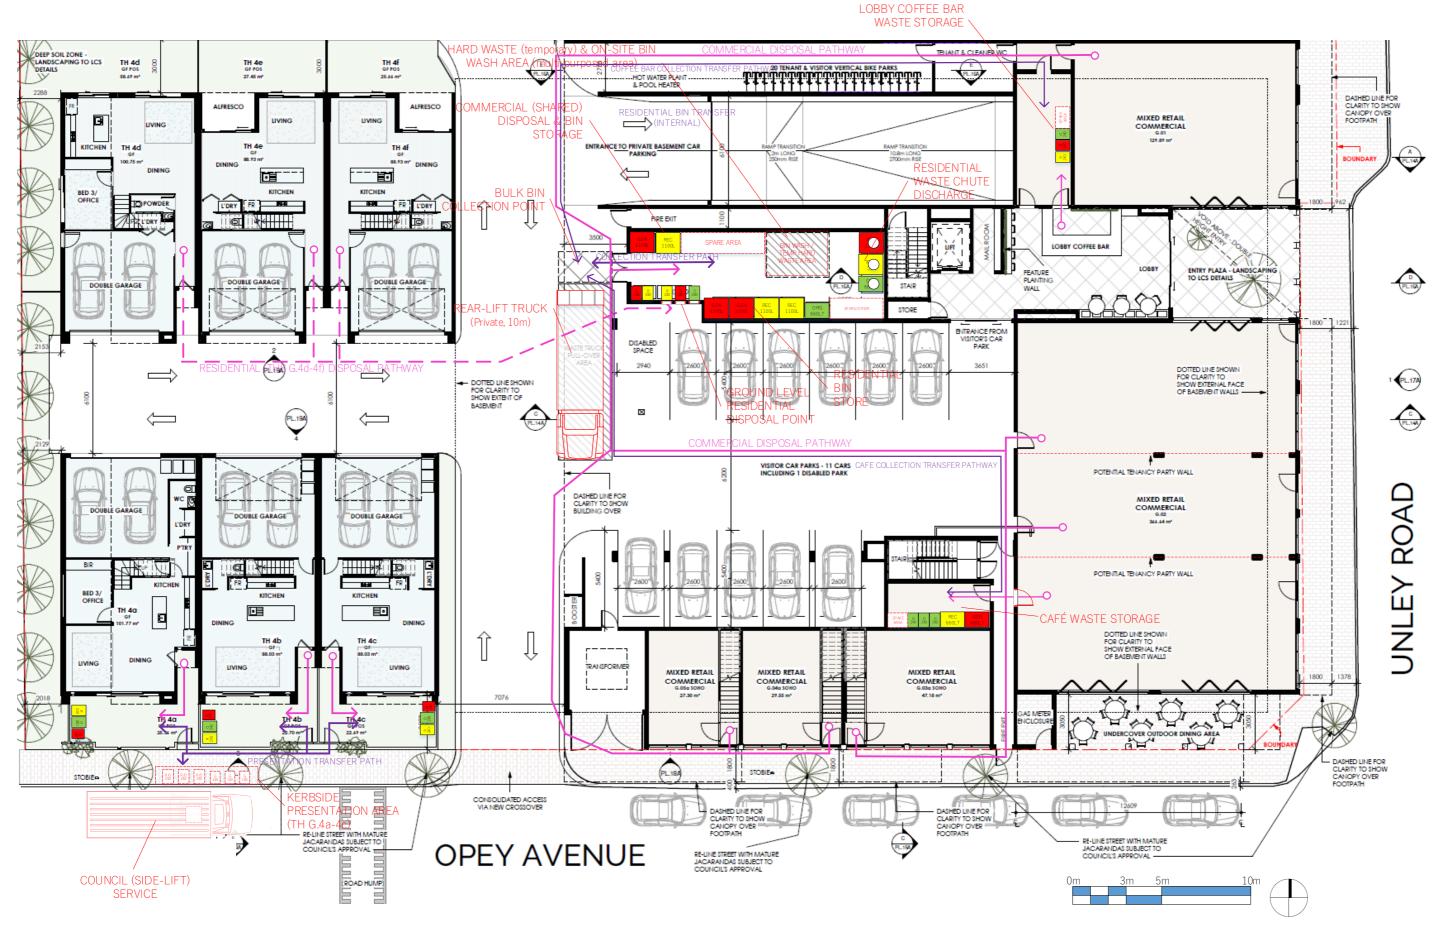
Ground level layout illustrating waste storage areas, transfer pathways (pink – disposal, purple – collection) and collection points
